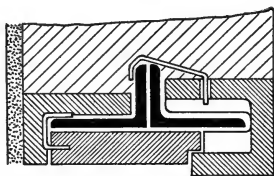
Lintel Section Alley Windows. Cable Building.
